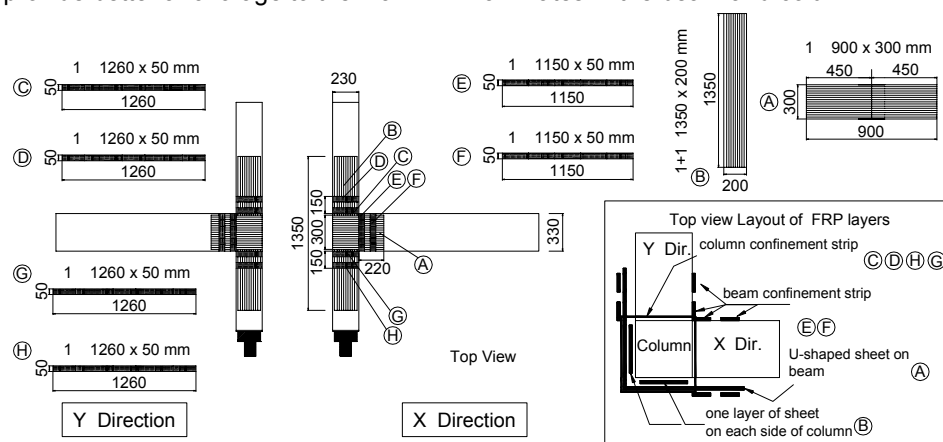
FRP retrofit configuration 3DGF1 for the 3D corner joint specimen
